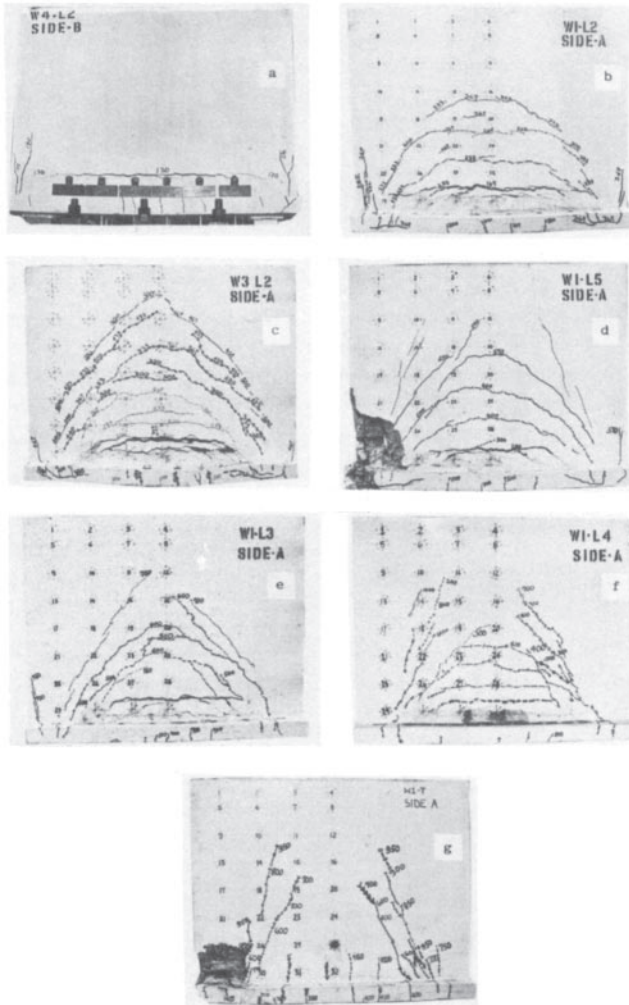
Final crack patterns a. W4-L2 ($r_v=0$) at 140 kN, soffit loading only; b. W1-L2 ($r_v=1.06\%$), soffit loading only; c. W3-L2 ($r_v=1.4\%$), soffit loading only; d. W1-L5 ($r_v=1.06\%$), 1:2 top and soffit loading; e. W1-L3 ($r_v=1.06\%$), 1:1 top and soffit loading; f. W1-L4 ($r_v=1.06\%$), 2:1 top and soffit loading; g. W1-L1 ($r_v=1.06\%$), top loading only.
